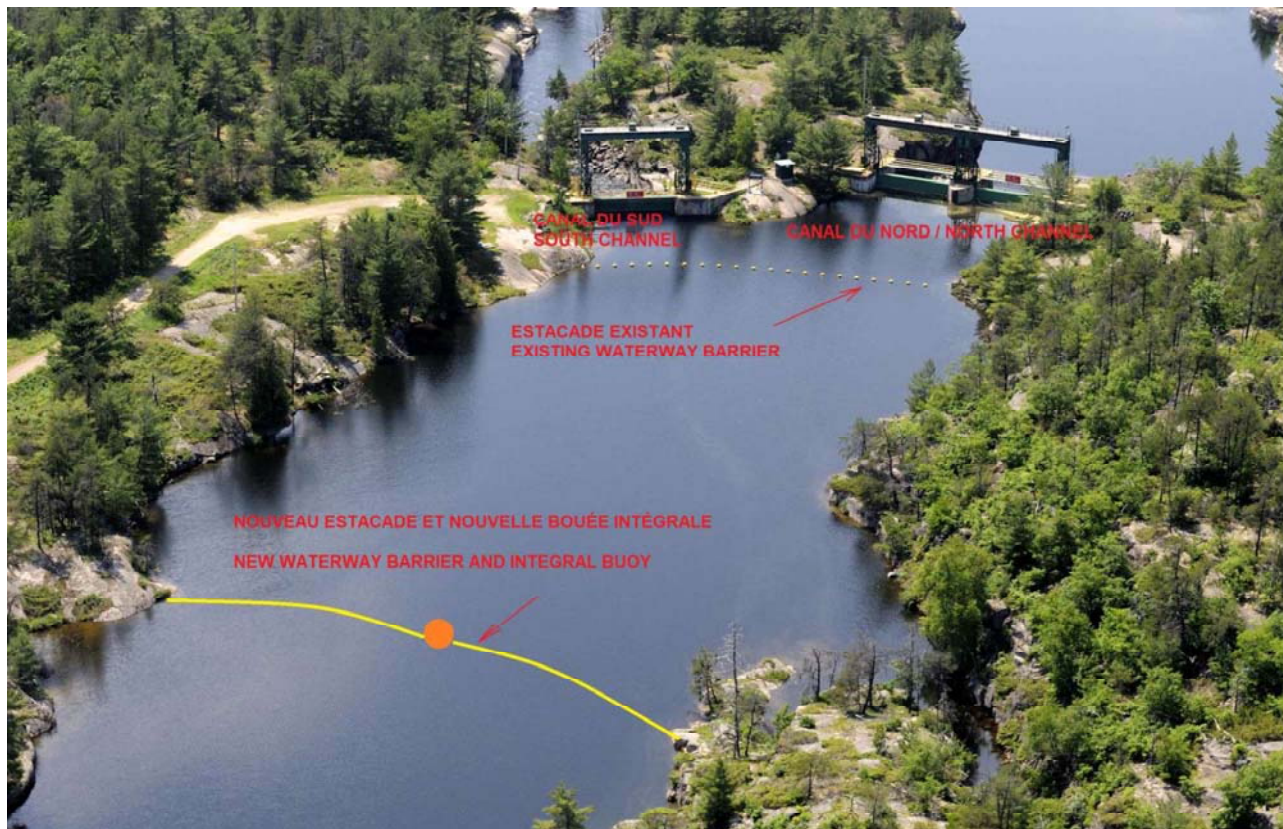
Big Chaudière Dam with previous dam structures in place. Also showing existing waterway barrier and approximate new location of waterway barrier complete with integral hazard buoy.
